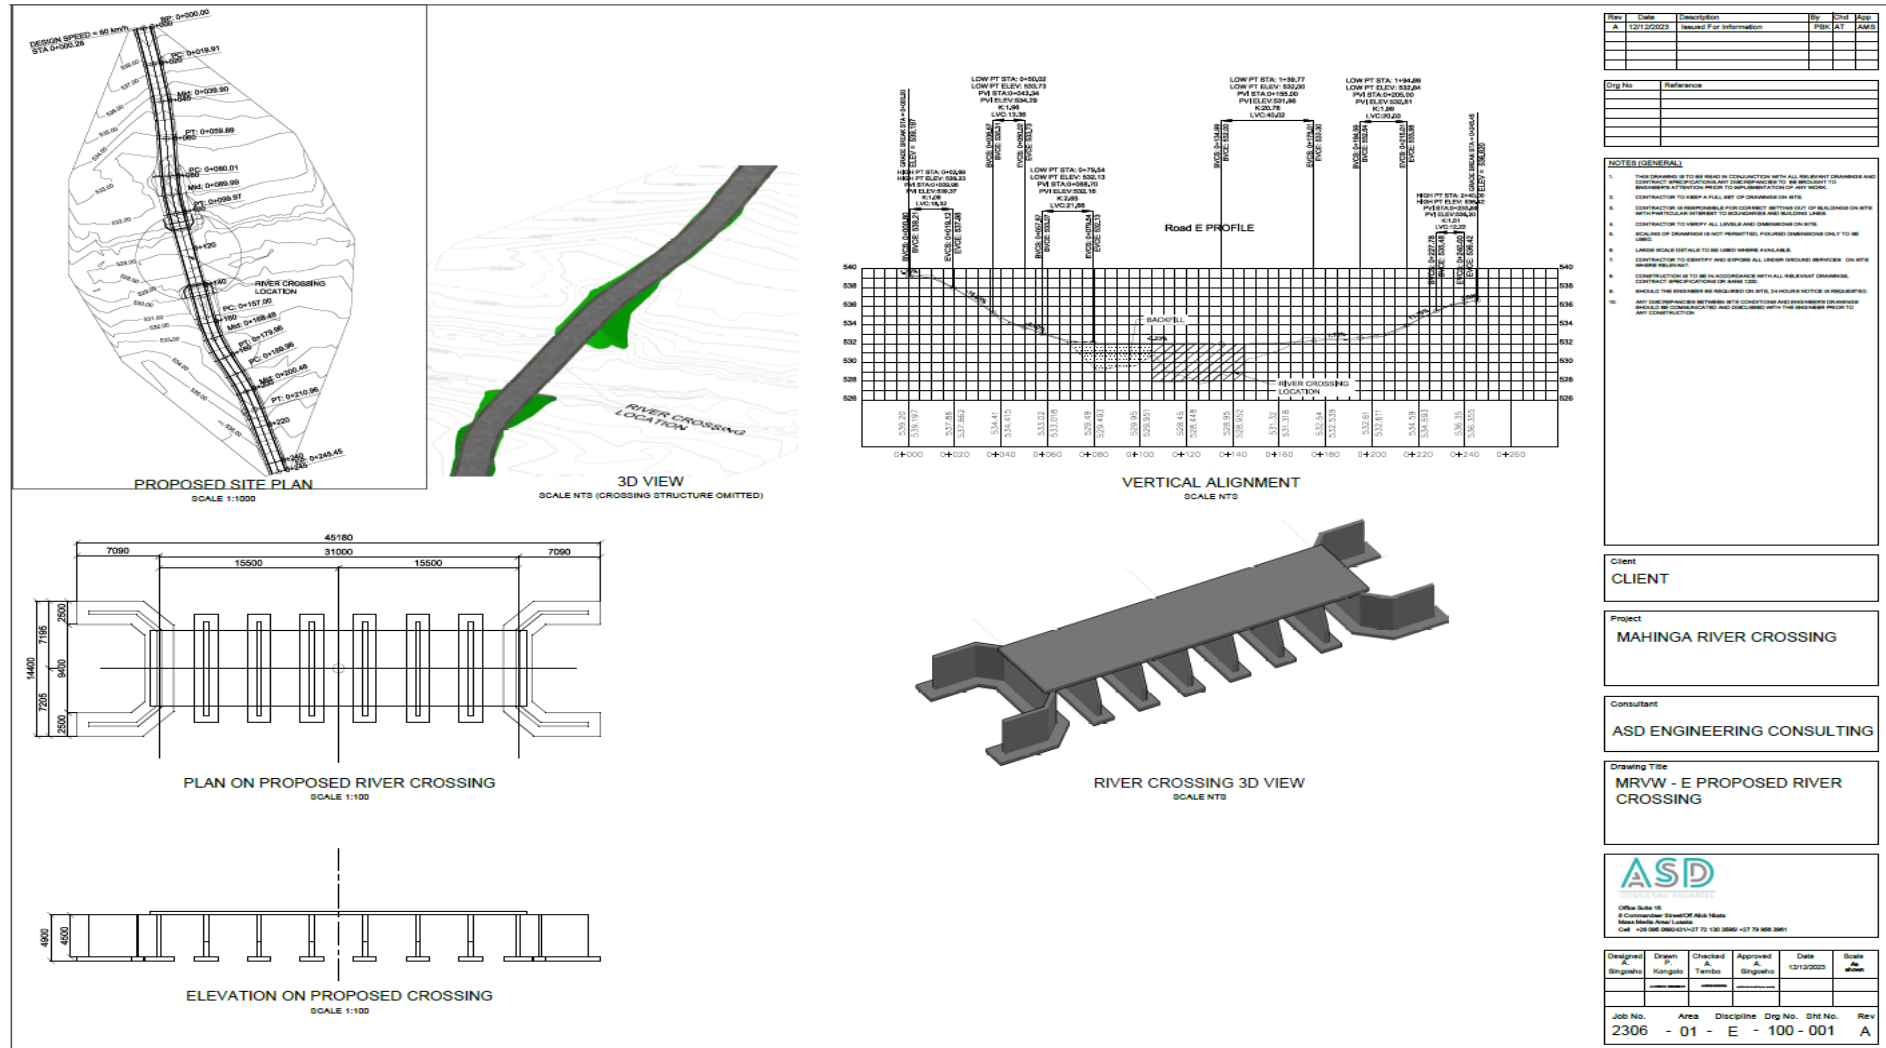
ASD drawing example for a bridge structure (please refer to Appendix A for all drawings)
